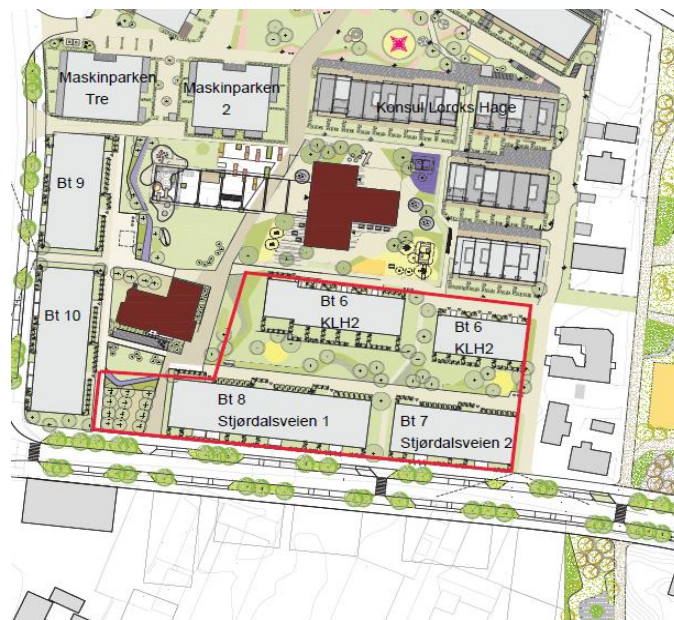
Illustration of the building stages at Lilleby- Fabrikkløkka
